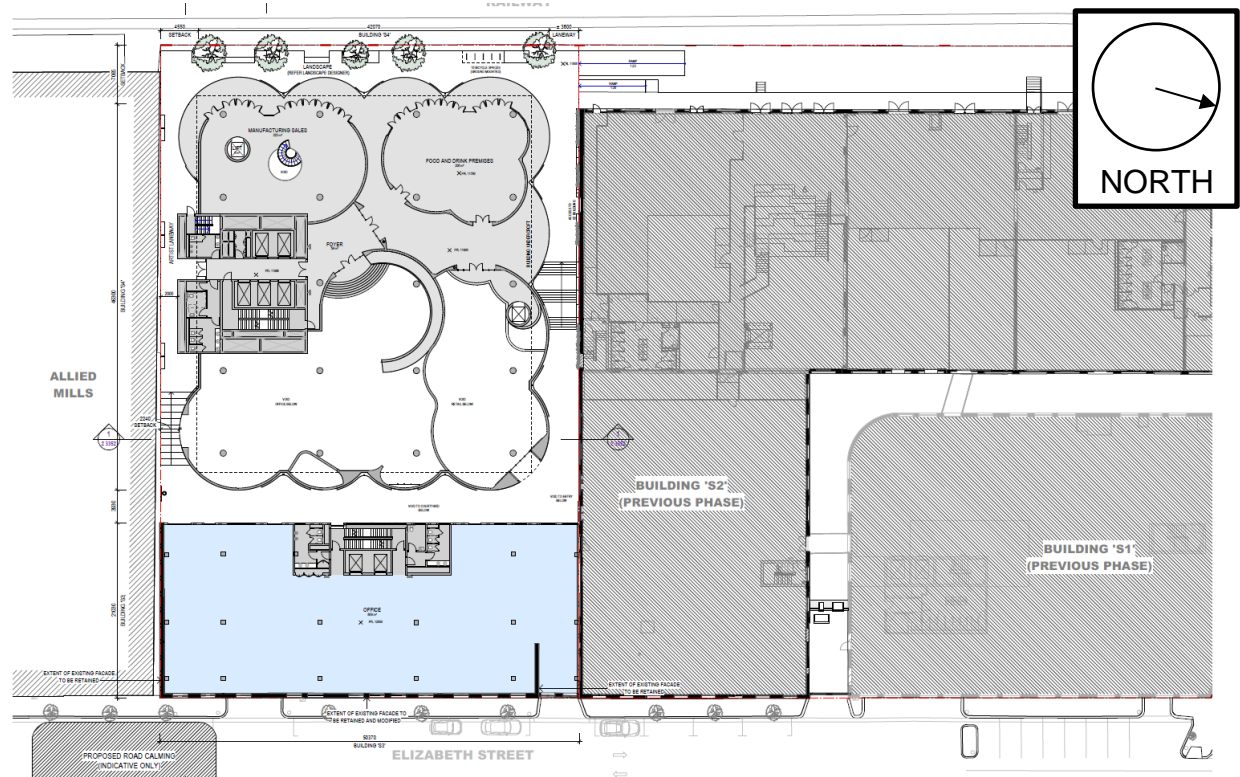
Ground floor plan of Stage 2 of the proposed 2-50 Elizabeth Street development
